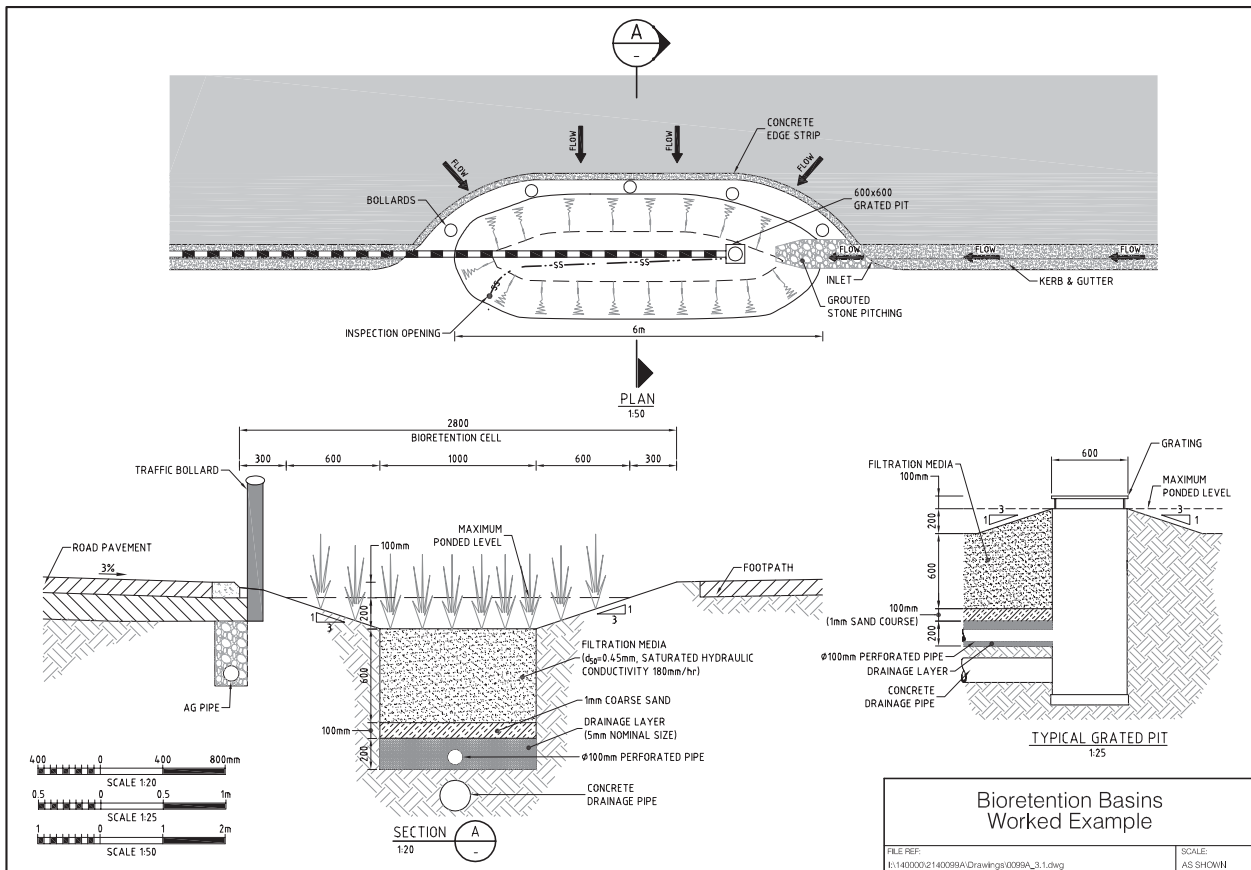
Construction drawing and a section view of the bioretention basin.
